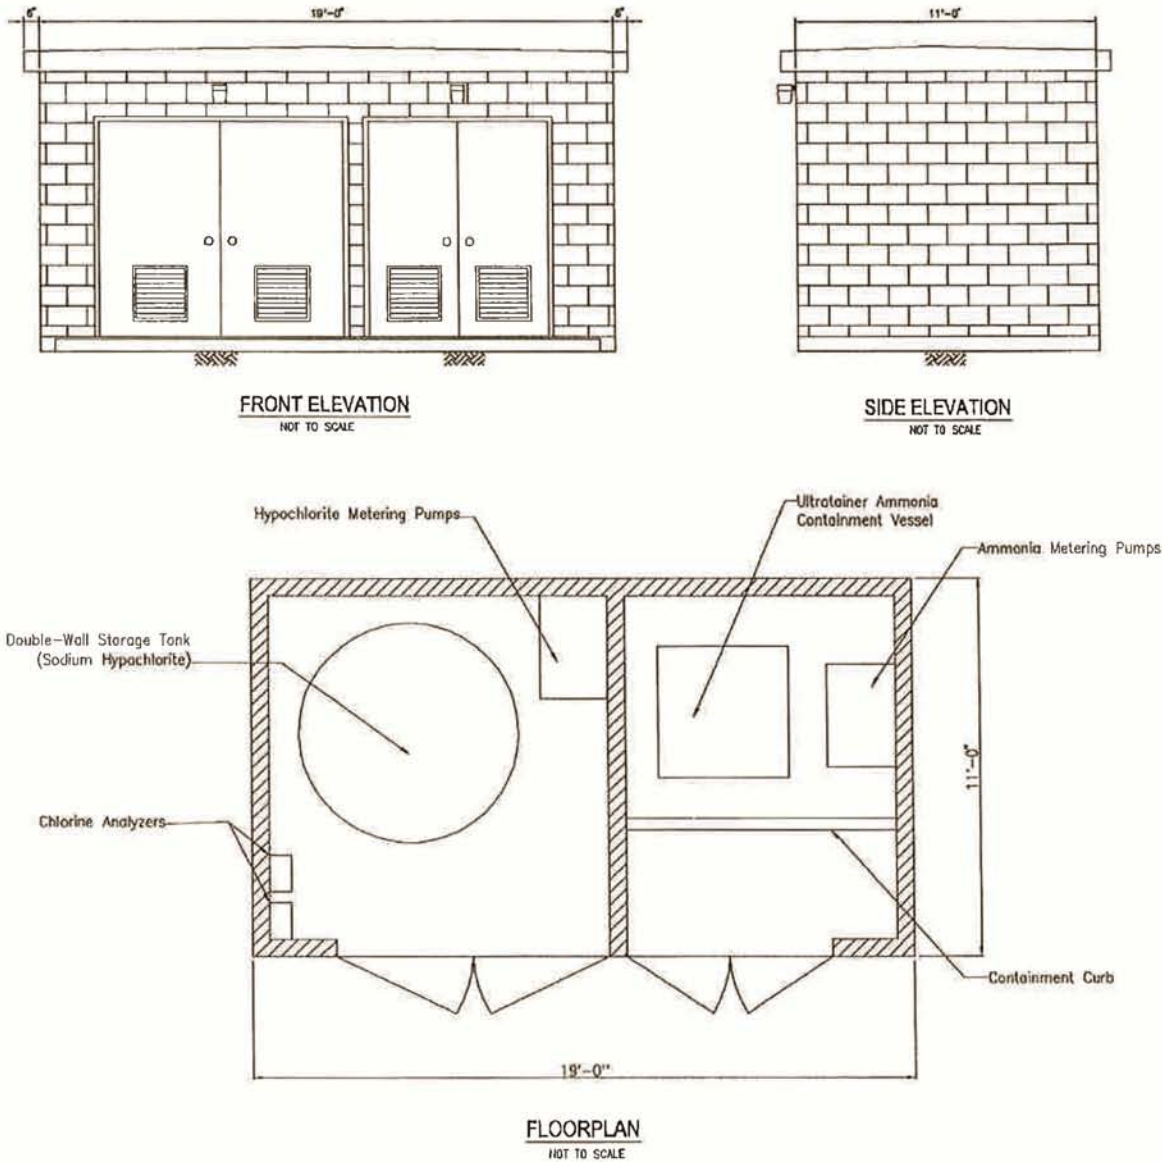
Proposed Chloramination Building Layout (Sundale)
